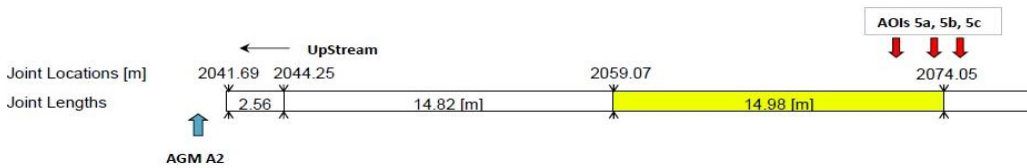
Dig Sheet 3 identifying 3 AOI's and 2 through holes.
